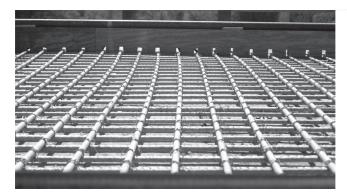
FRP-reinforced deck constructed in Lima, OH (Pierce Street Bridge), in 1999.
